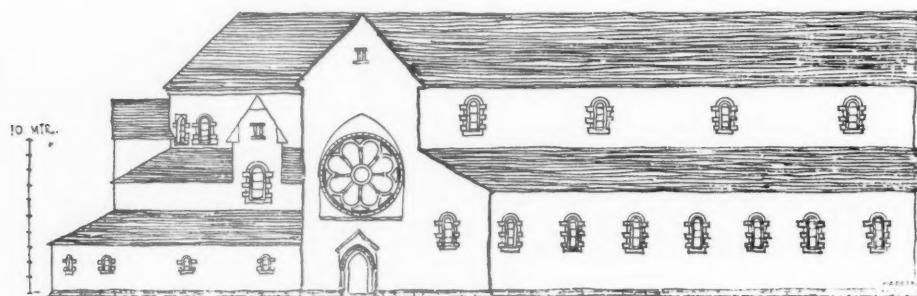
RECONSTRUCTION OF NORTH FAÇADE, CIRCA 1260
